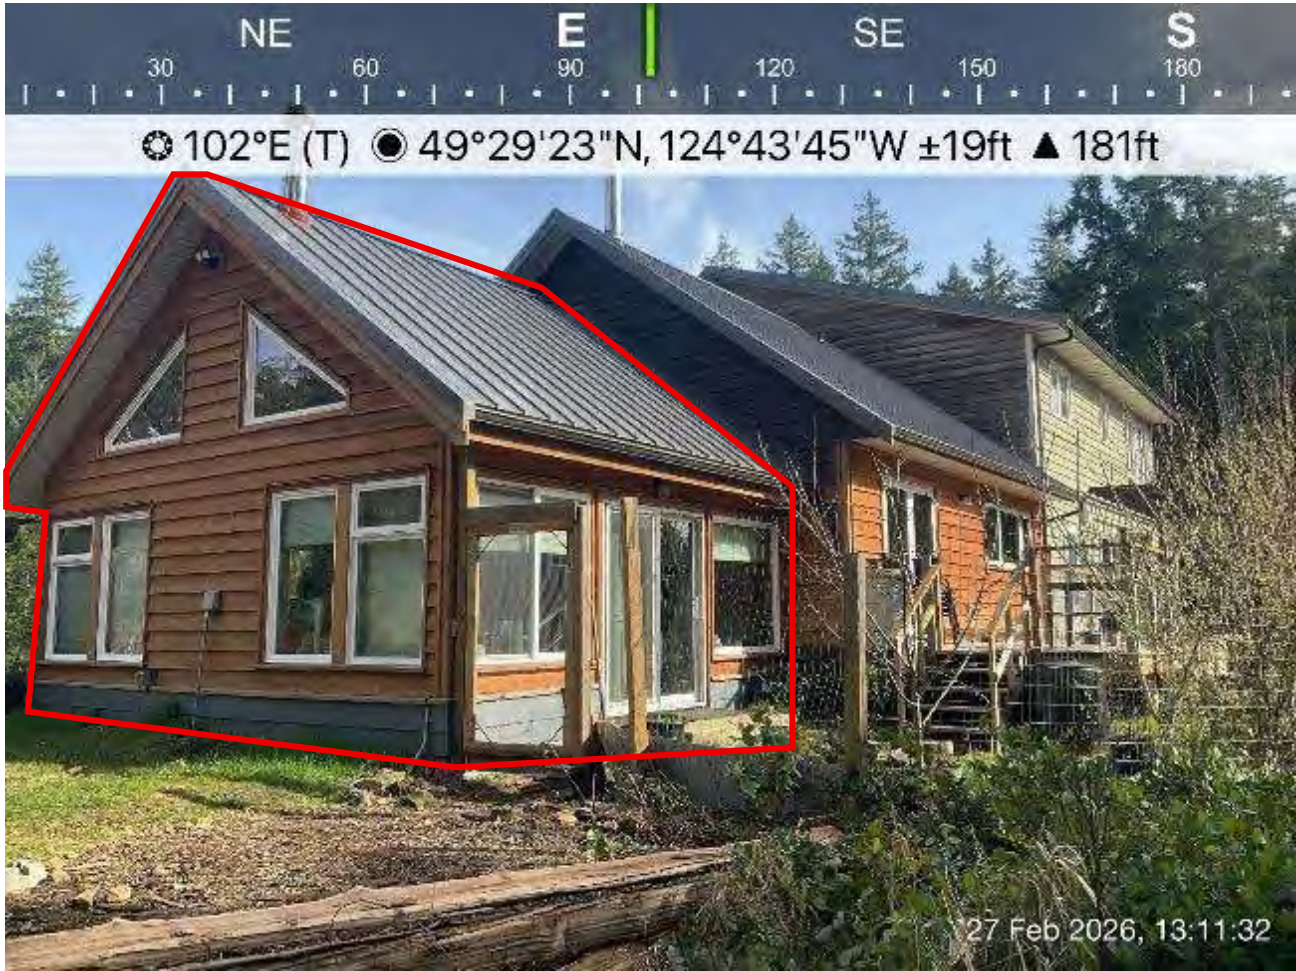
VIEW EAST OF THE EXISTING DWELLING WITH THE UNPERMITTED ADDITION HIGHLIGHTED IN RED WITHIN DPA 2.
